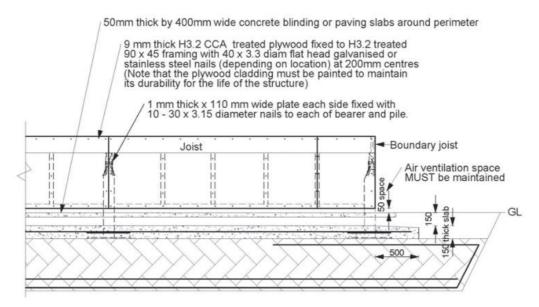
An excerpt from the MBIE Guide illustrating the plywood bracing
